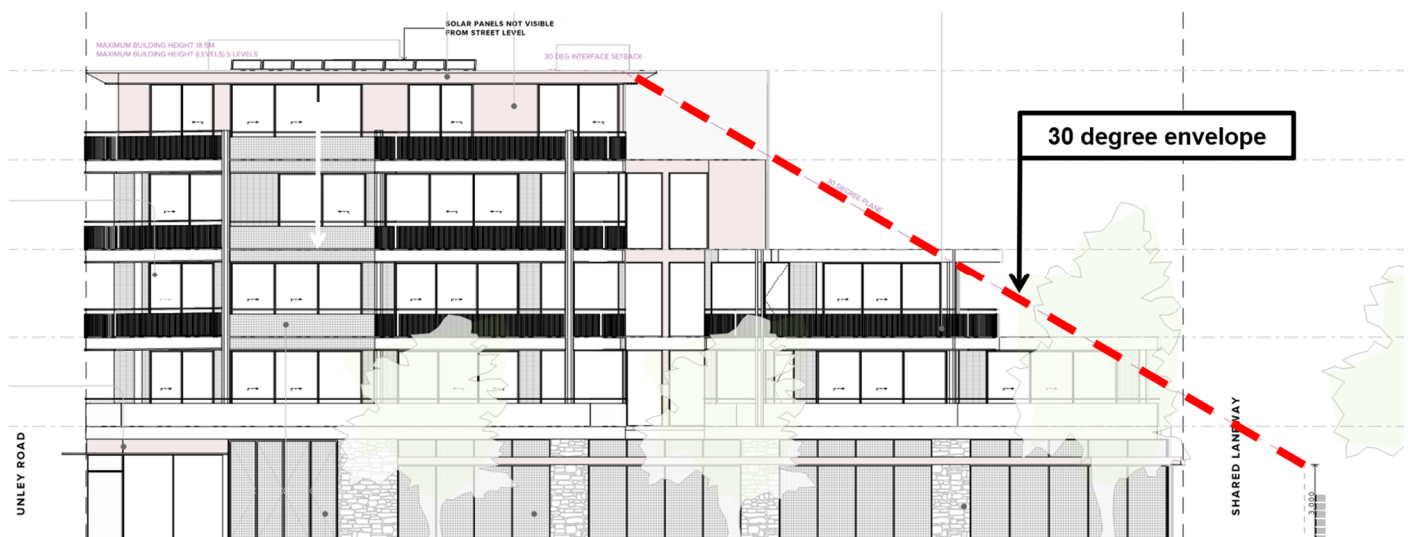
North Elevation (including recommended 30-degree plane for built form envelope)
